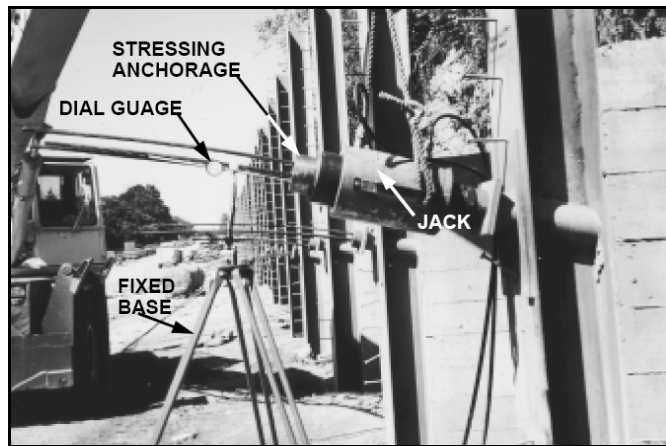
Typical equipment for load testing of strand ground anchor.
